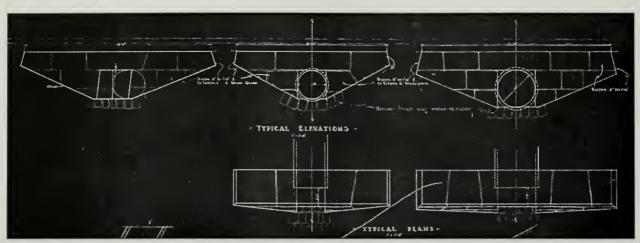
Culvert detail for an 18-inch RCP with a dry-laid stone headwall, from Schoodic Loop Road, 1934. (U.S. Department of Agriculture, Bureau of Public Roads, Project 5A1, 1934)
